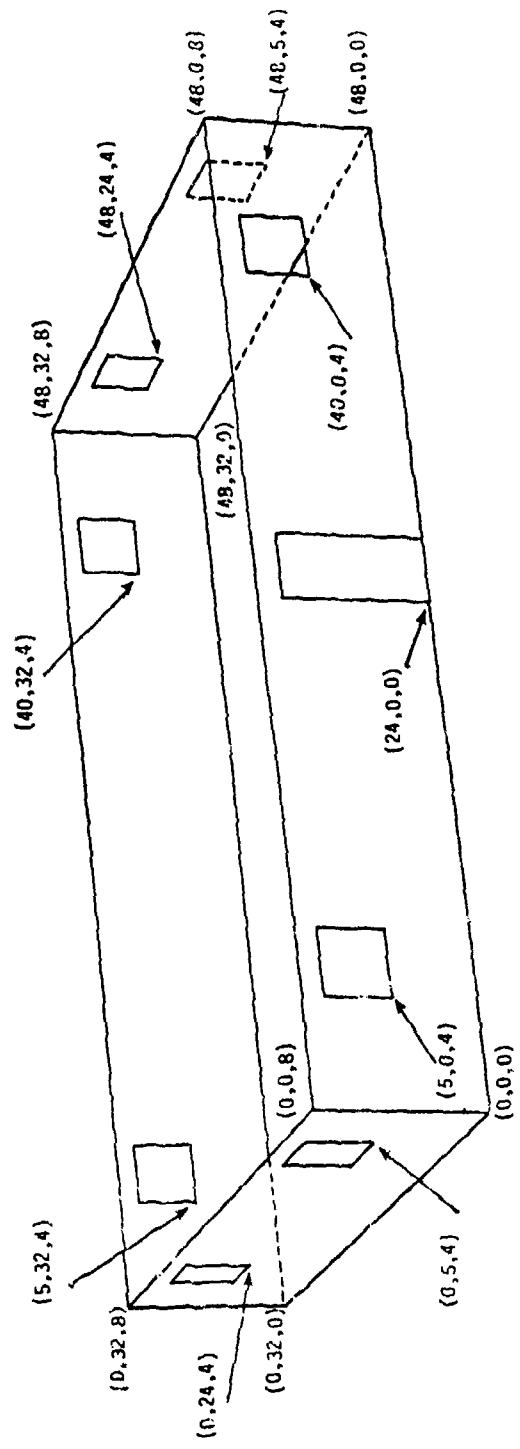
Exterior Aperture Locations for Floor Plans 1, 2, and 3
